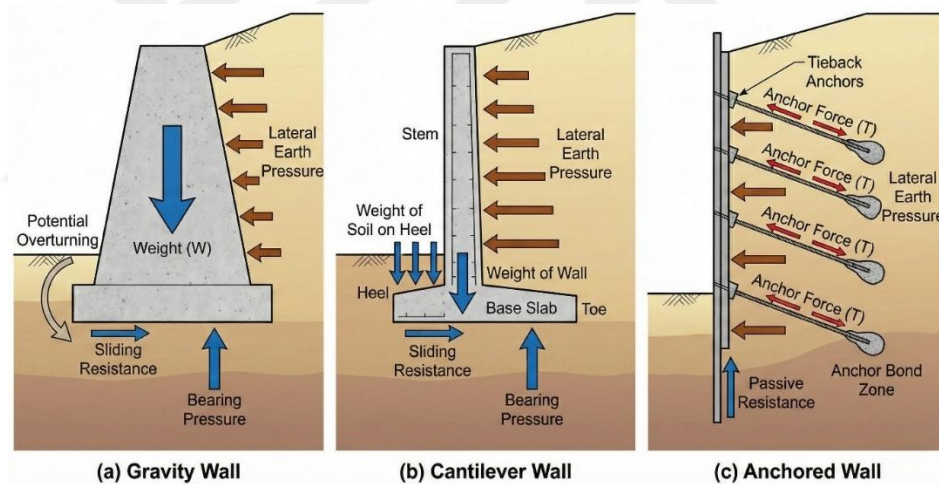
Comparative cross-sections of common retaining wall types: (a) Gravity Wall, (b) Cantilever Wall, and (c) Anchored Wall, illustrating load transfer mechanisms (Das, 2010)
